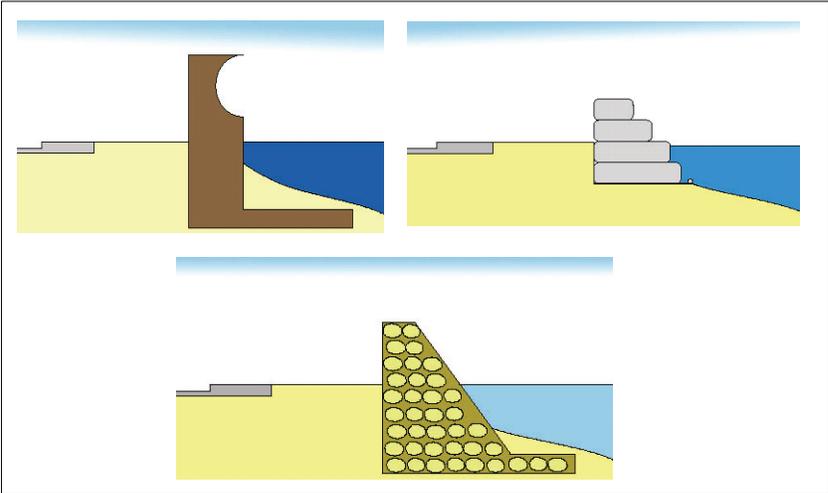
Protections Engineering in Cartagena. Levee Concrete, Geotextile and Rock
